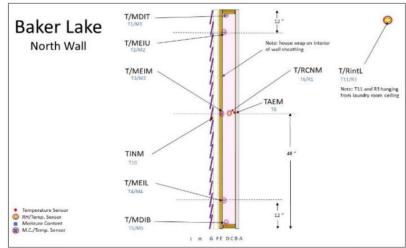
The wall system and monitoring sensor positions for the wall in Unit A
